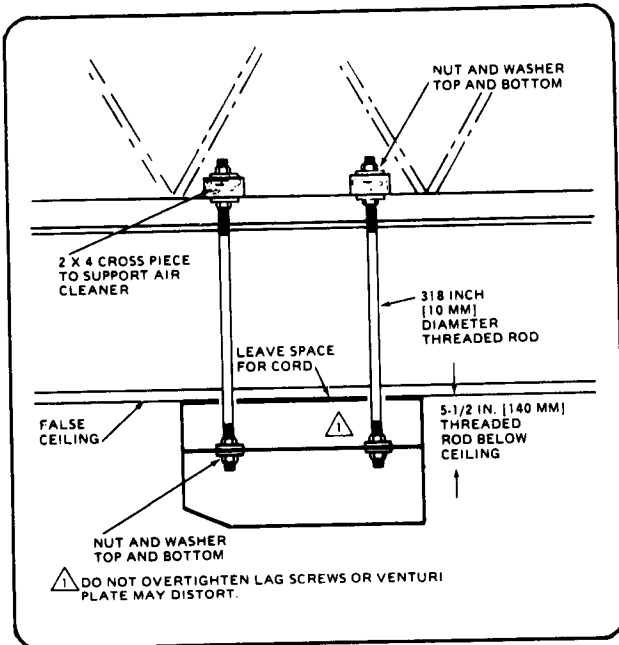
HANG THE C-12 FROM THE THREADED STEEL RODS WHICH BOLT TO THE VENTURI PLATE.
